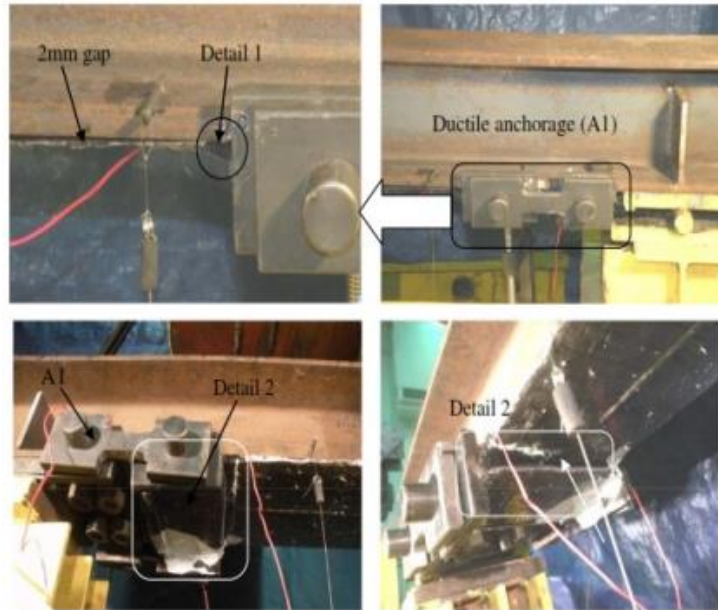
Anchorage system for retrofit steel beams with FRP. By: Galal.
